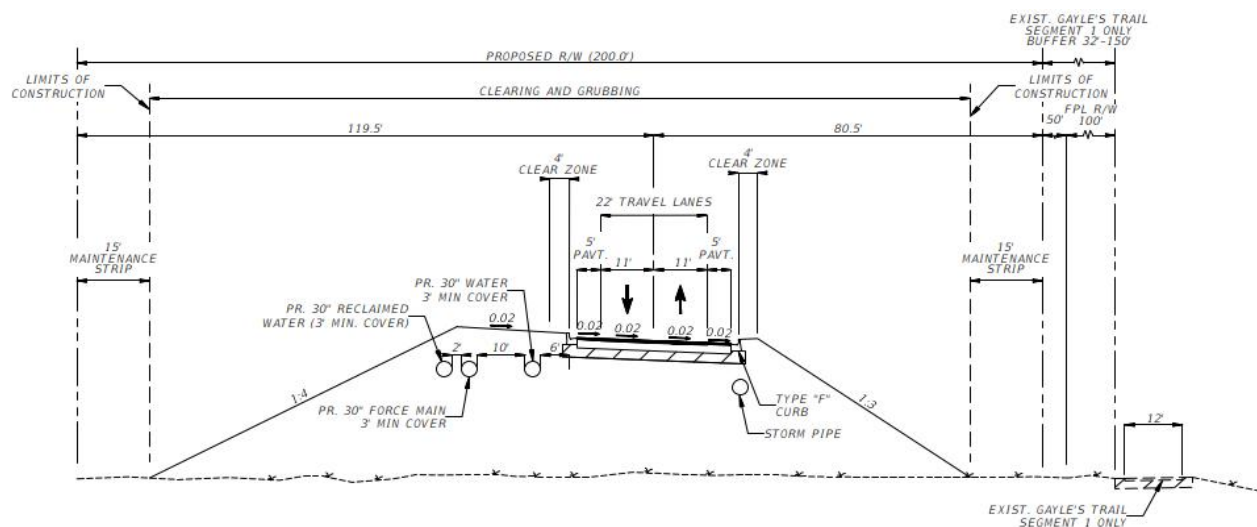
Build Alternative Typical Section, Clara Avenue to St. Joe Property Line
